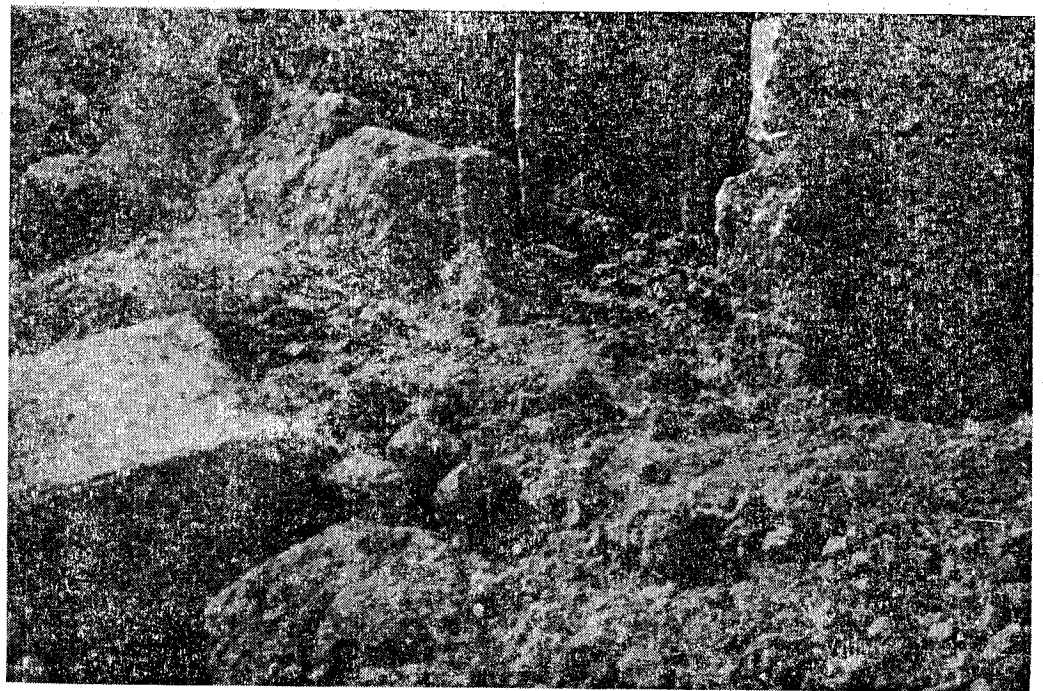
(b) —Collapse of mud wall and overtopping of mud block in Kolabug Village.
